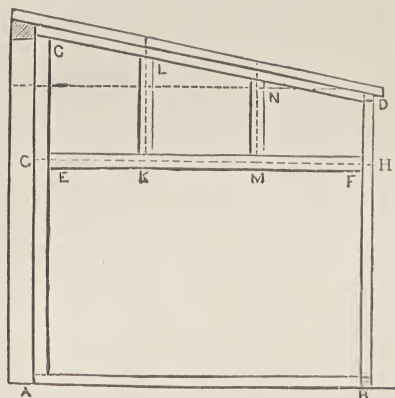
LEFT END OF CONCRETE SLAB BUILDING.
